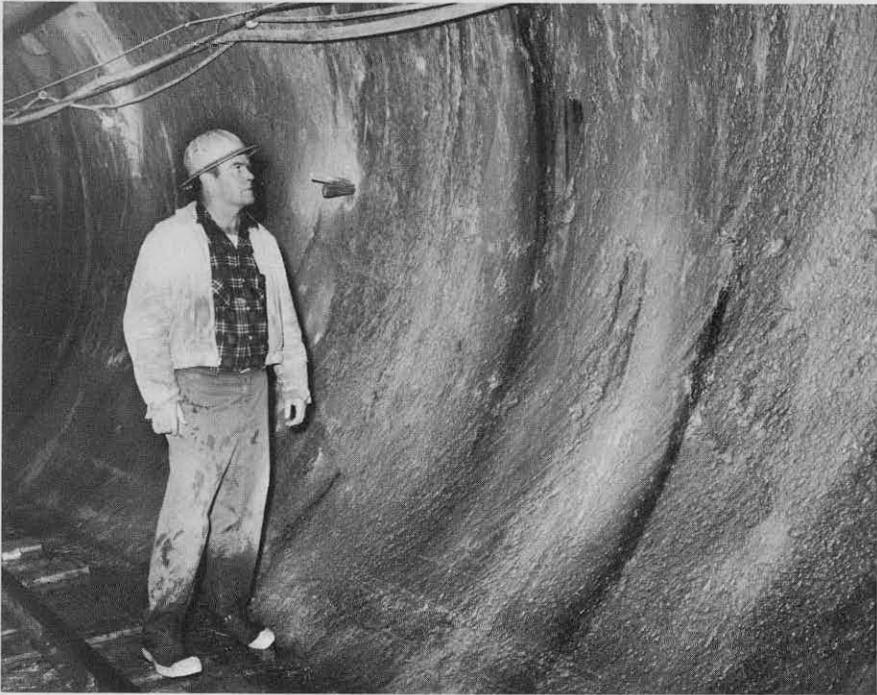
Southwest wall of the Mole-driven tunnel at sta. 510+50, showing bedding in the Cambridge argillite.
